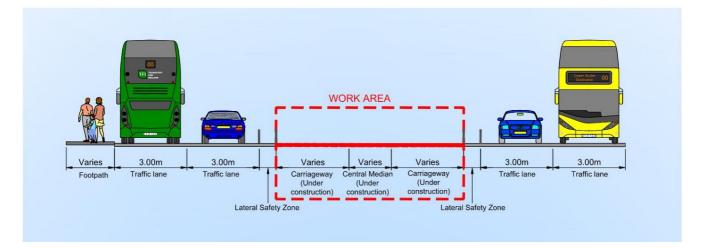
Traffic Management Cross Section, Section 3a - Stage 1
